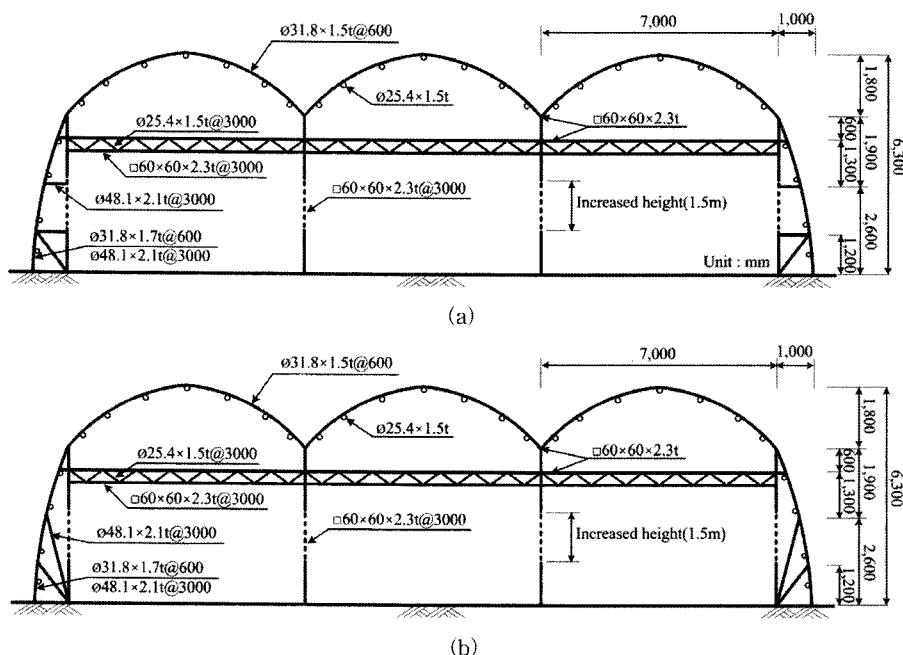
Recommended reinforcement methods for the elevated eaves height 1-2W A-type plastic greenhouse: (a) Lattice type cross beam and horizontal reinforcements on windbreak wall; (b) Lattice type cross beam and inclined reinforcements on windbreak wall.
